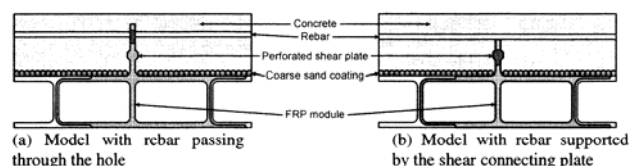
Section detail of modular hybrid FRP-concrete deck system (Kim et al., 2005)
